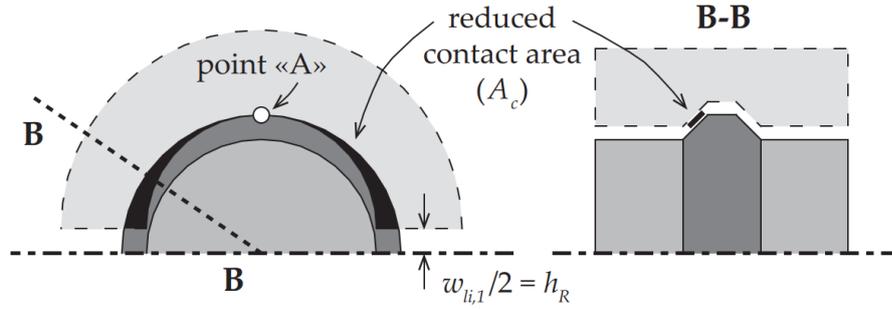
Contact area between reinforcement rib and surrounding concrete [12]
